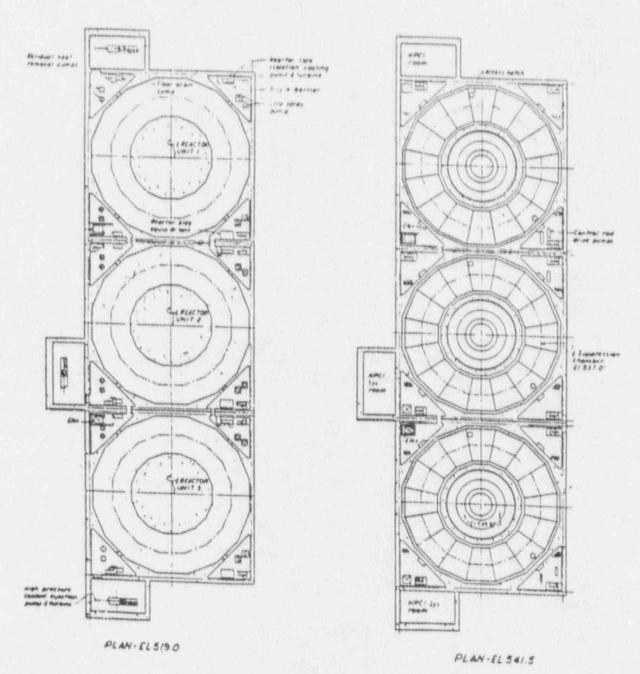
Overall Layout of the Browns Ferry Nuclear Plant, Elevations 519 ft. and 541.5 ft.
